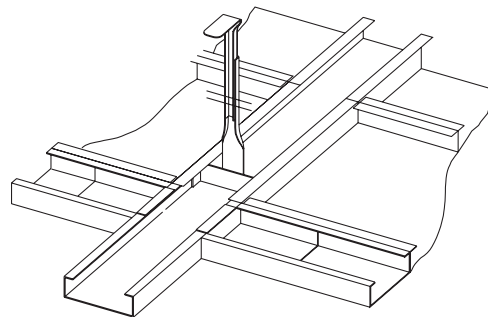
Accentuated longitudinal/transverse joint; Example C (lay-on assembly)
